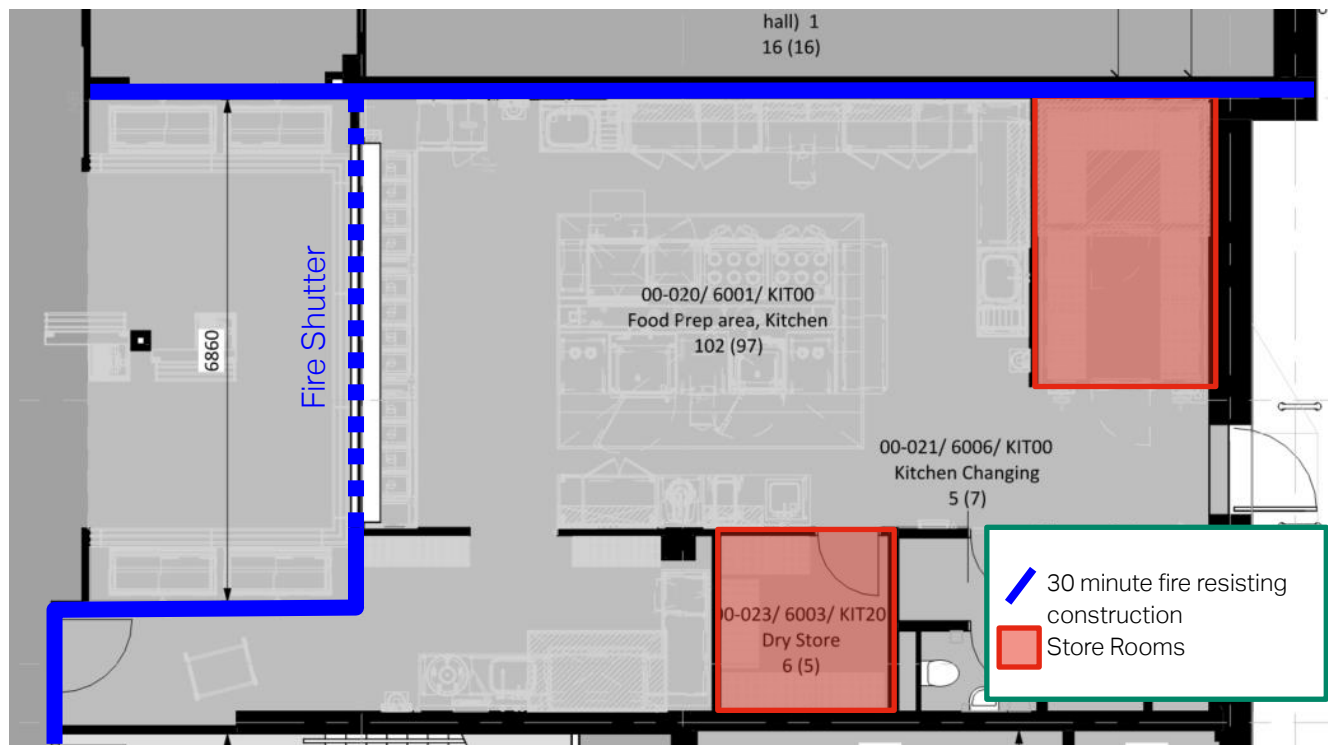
Kitchen layout showing fire resisting enclosure and store rooms
